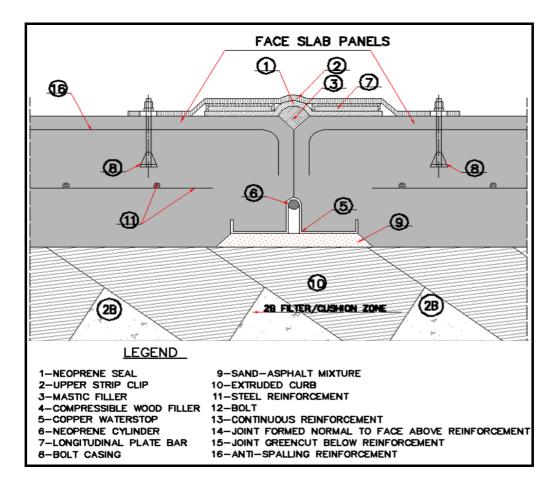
Details of vertical expansion joints of Gökçeler Dam (Hidro Dizayn, 2007-c)
